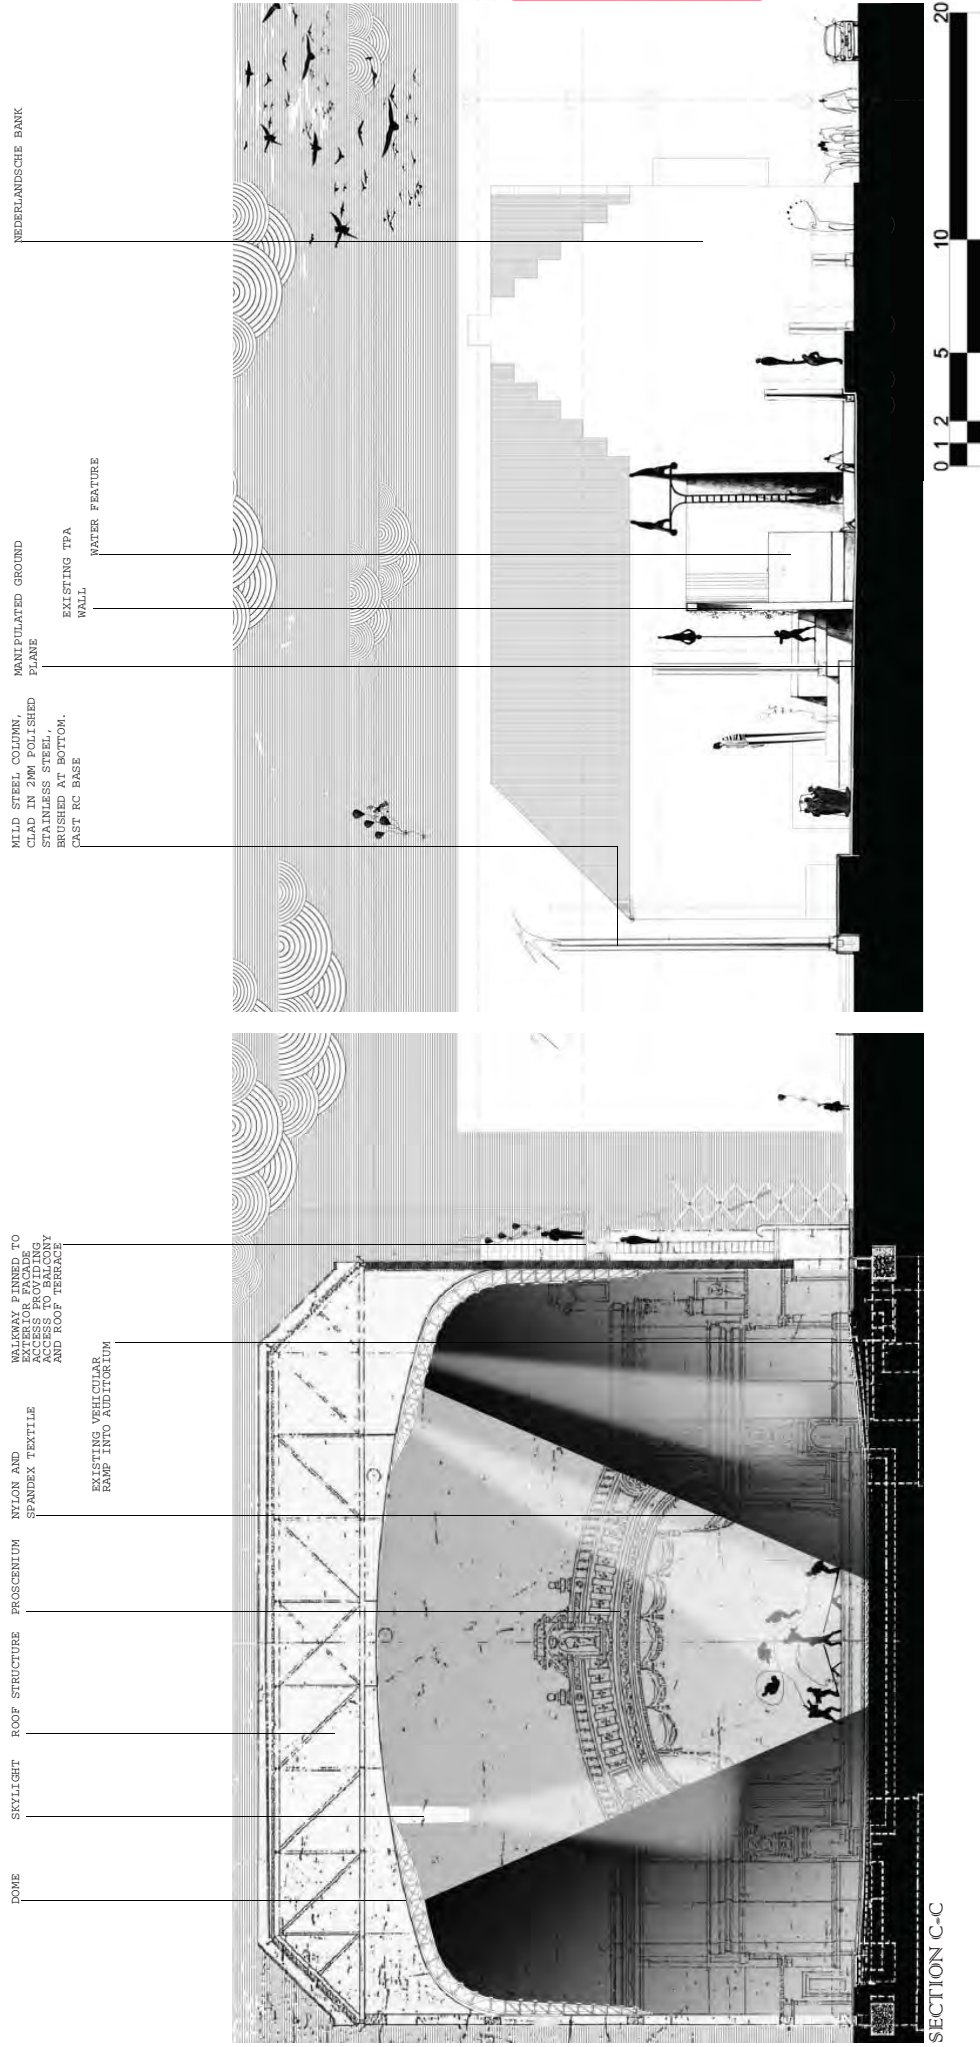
Section C-C: Illustrating extended interior, reflective WC's, stage and proscenium, trusses, hydraulic elevator and walkways on auditorium facade extending the skin
